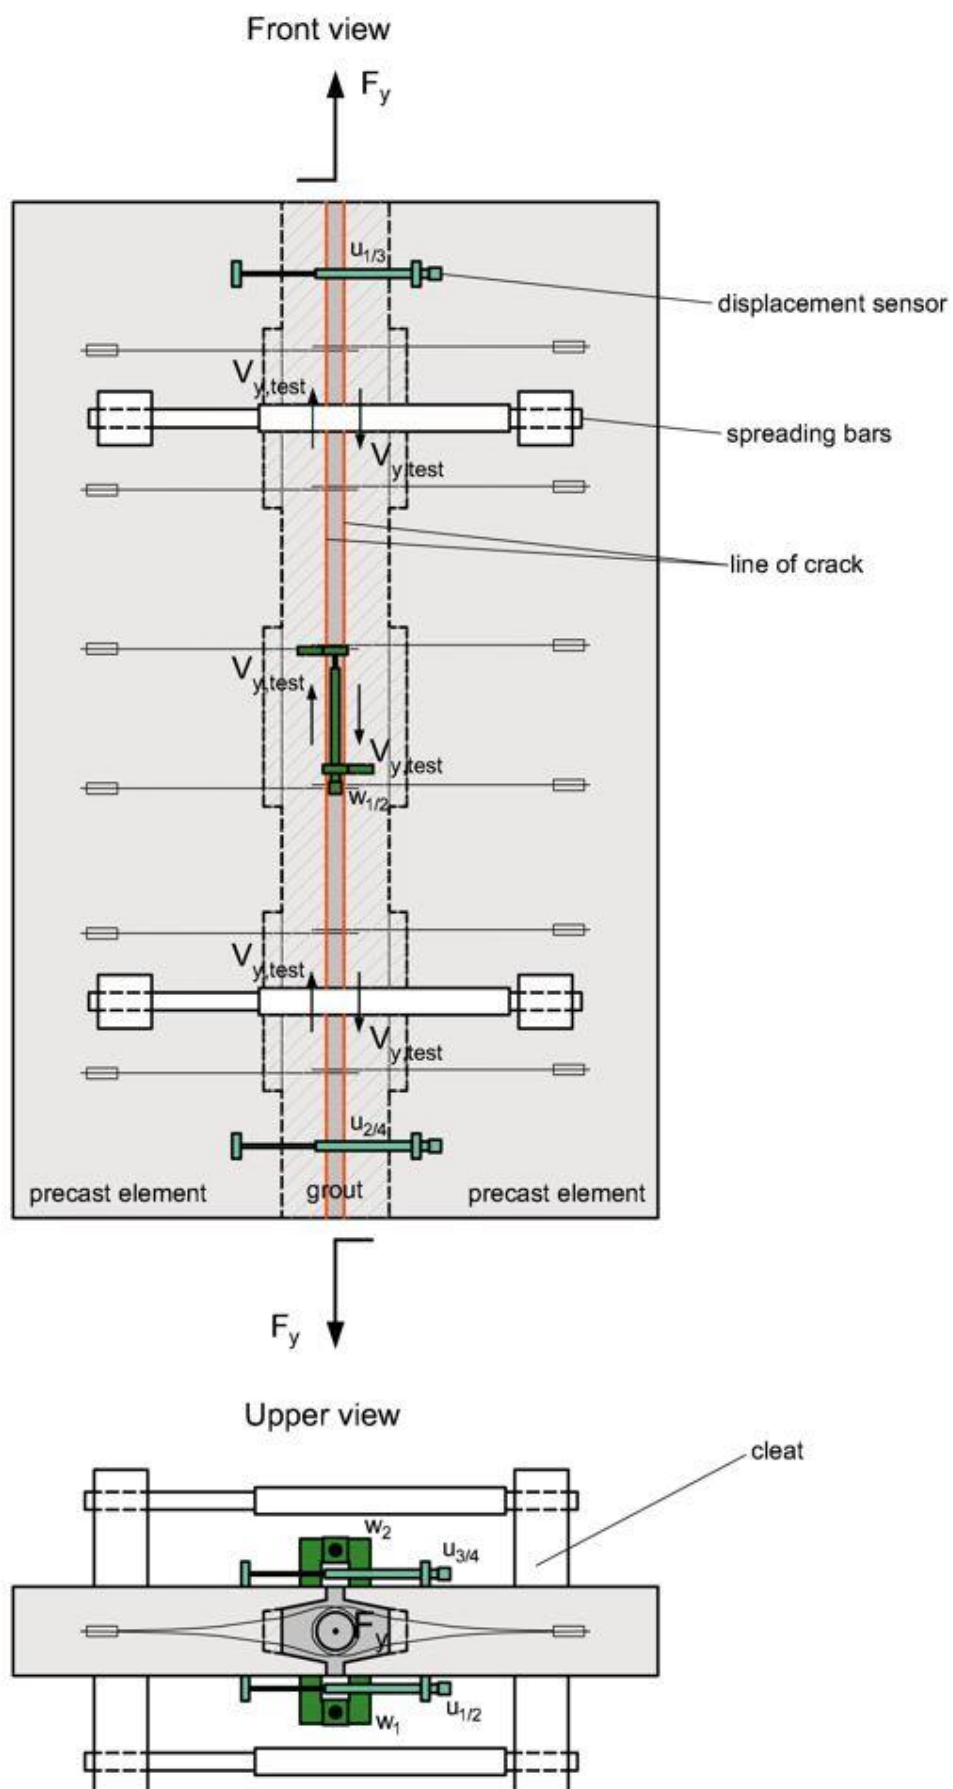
Test setup for connections of two precast concrete elements
